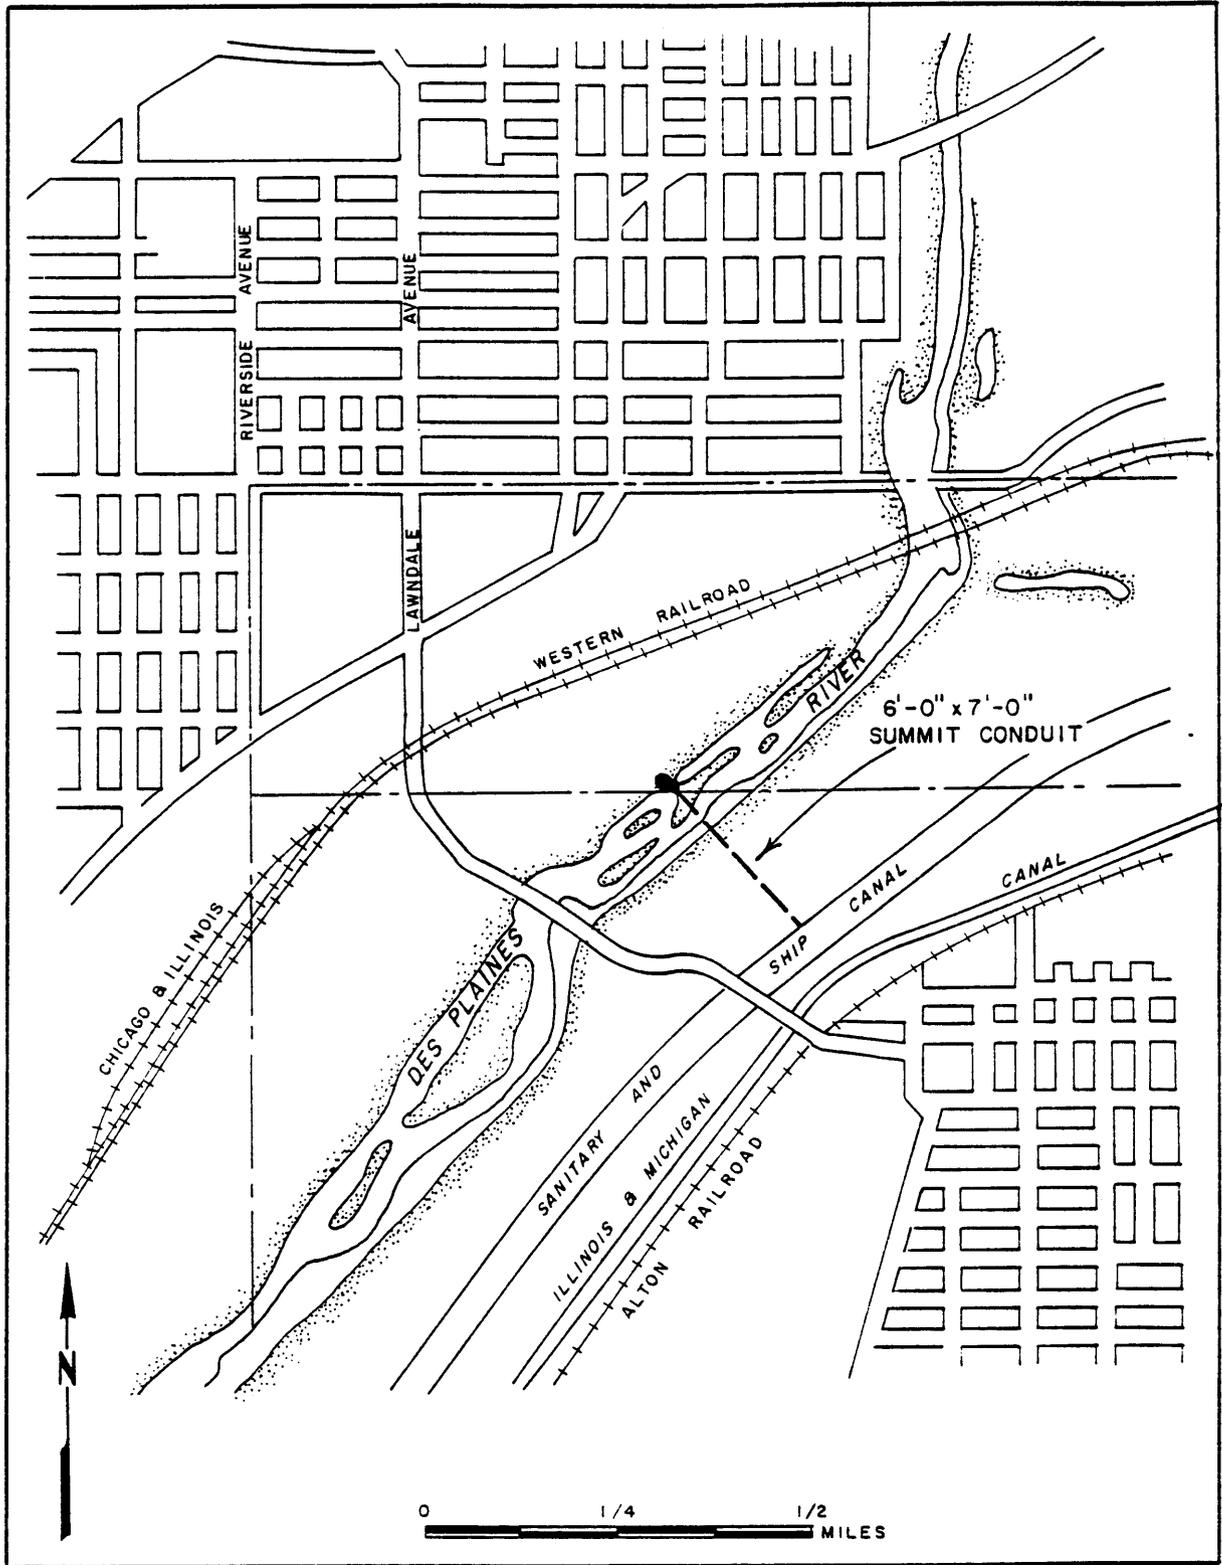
DETAILED LOCATION PLAN - SUMMIT CONDUIT
